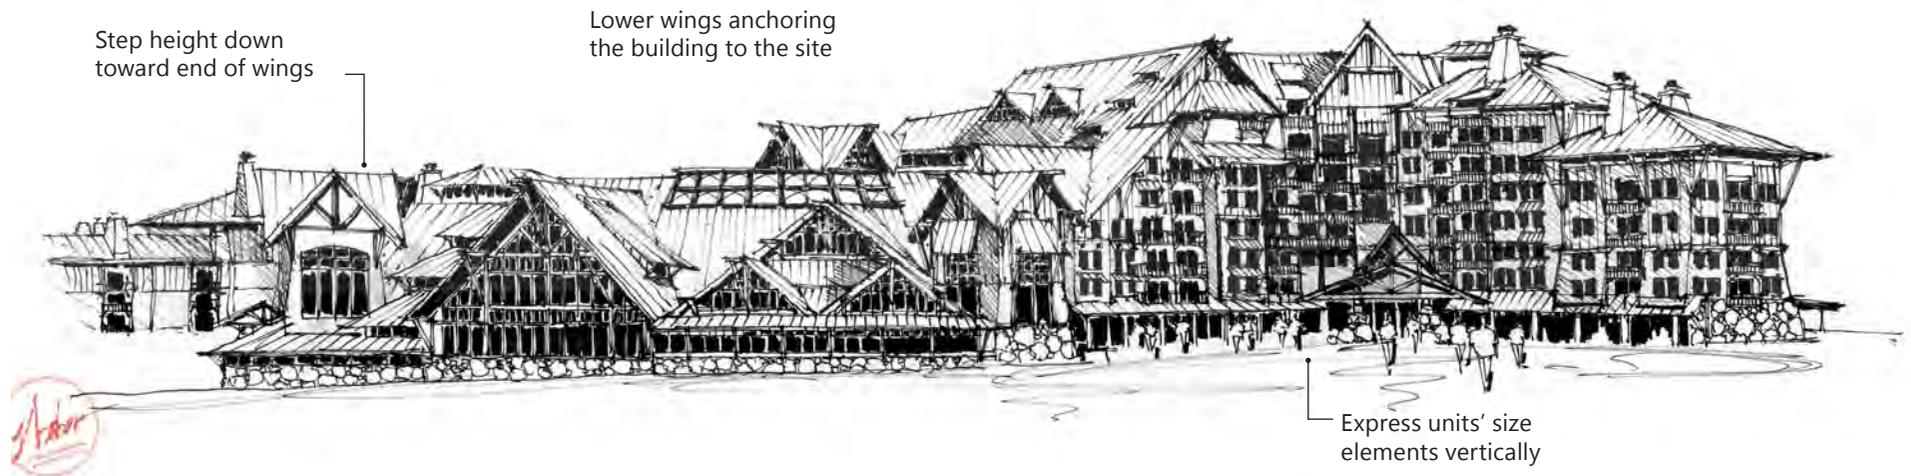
Typical Grand Camp Building Form, Mass & Scale
